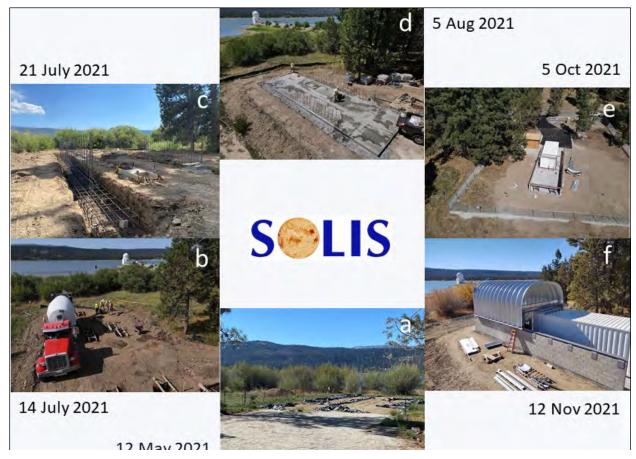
Progress on SOLIS construction: (a) pre-construction site on 12 May 2021; (b) 14 July 2021, installation of concrete footing for the SOLIS telescope mount and ISS shelter; (c) 21 July 2021, construction of the foundation for the walls; (d) 5 Aug. 2021, completion of the main concrete pad; (e) 5 Oct. 2021, aerial view of the SOLIS construction site with ISS shelter installed; (f) 12 Nov. 2021, canopy installation. Photos are courtesy of S. Shumko (BBSL/NJIT) and G. Card.
